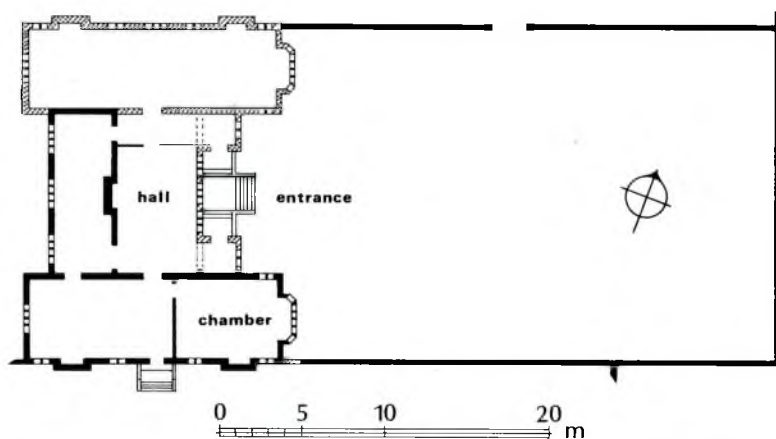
Peel Hall plan; the surviving part is in black, the remainder is reconstructed
